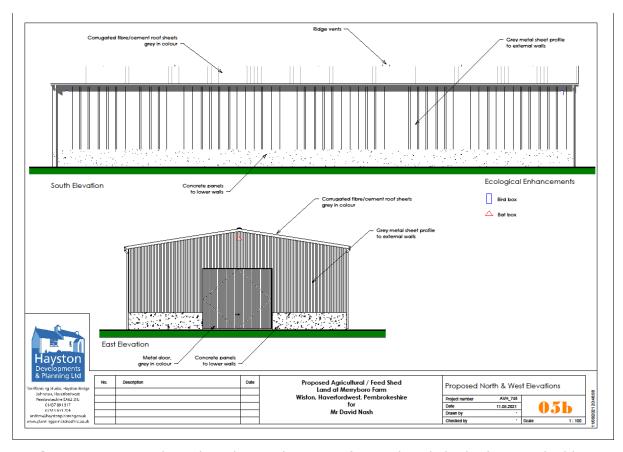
Proposed south and east elevation of agricultural shed. Plan supplied by client.
